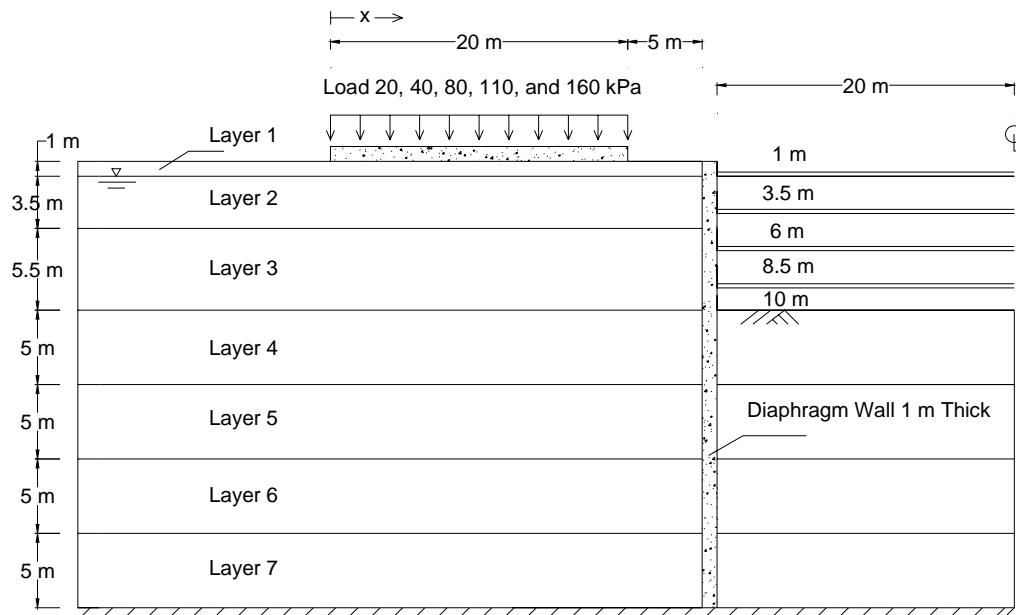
Cross-Section of Example 1: 2-D Hypothetical Excavation
